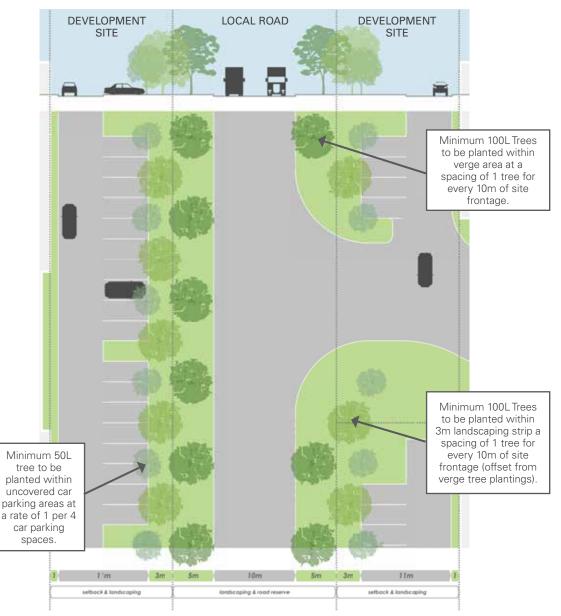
Cross section outlining the primary street frontage landscaping requirements within front setback area and road verge in accordance with the development controls under section 2.5.1 and 2.5.2.
